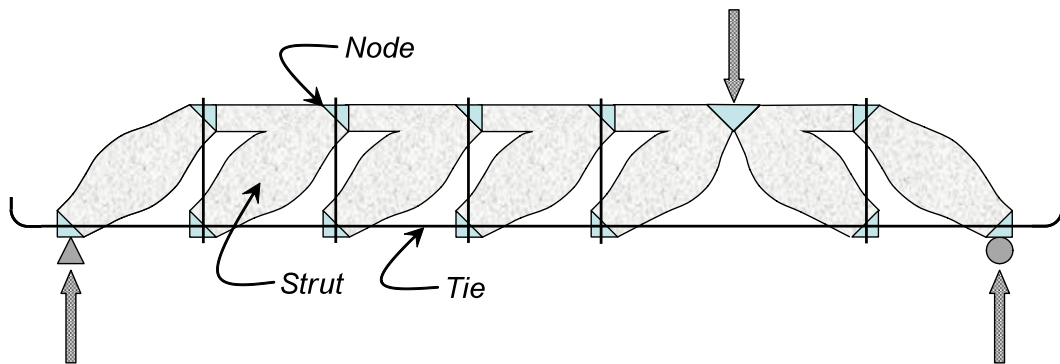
Strut-and-tie model with truss elements drawn to scale.
